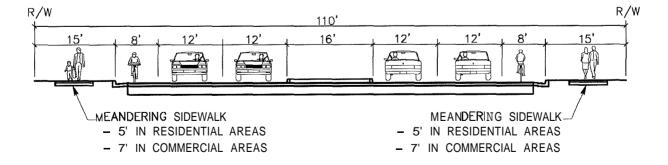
Segment 2 and 3 – Ultimate Roadway Sectioiz with Bicycle Lanes (Looking East)
